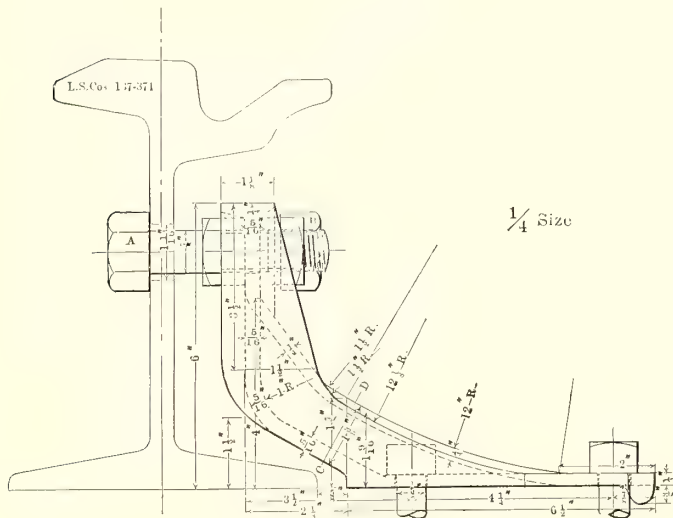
DETAILS OF SPECIAL RAIL CHAIRS ON BRIDGES
